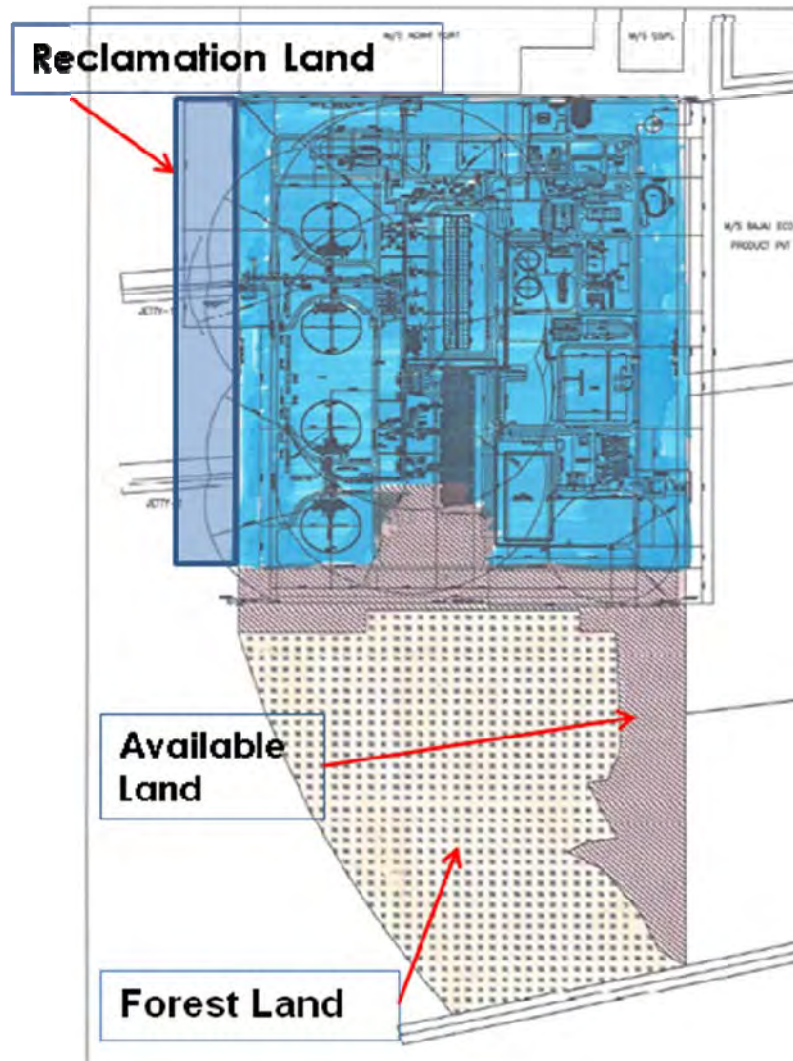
LAND REQUIREMENT DETAILS
